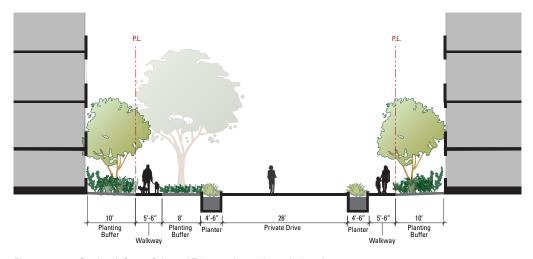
Section H. Garner Drive and Tubman private drive typical section
